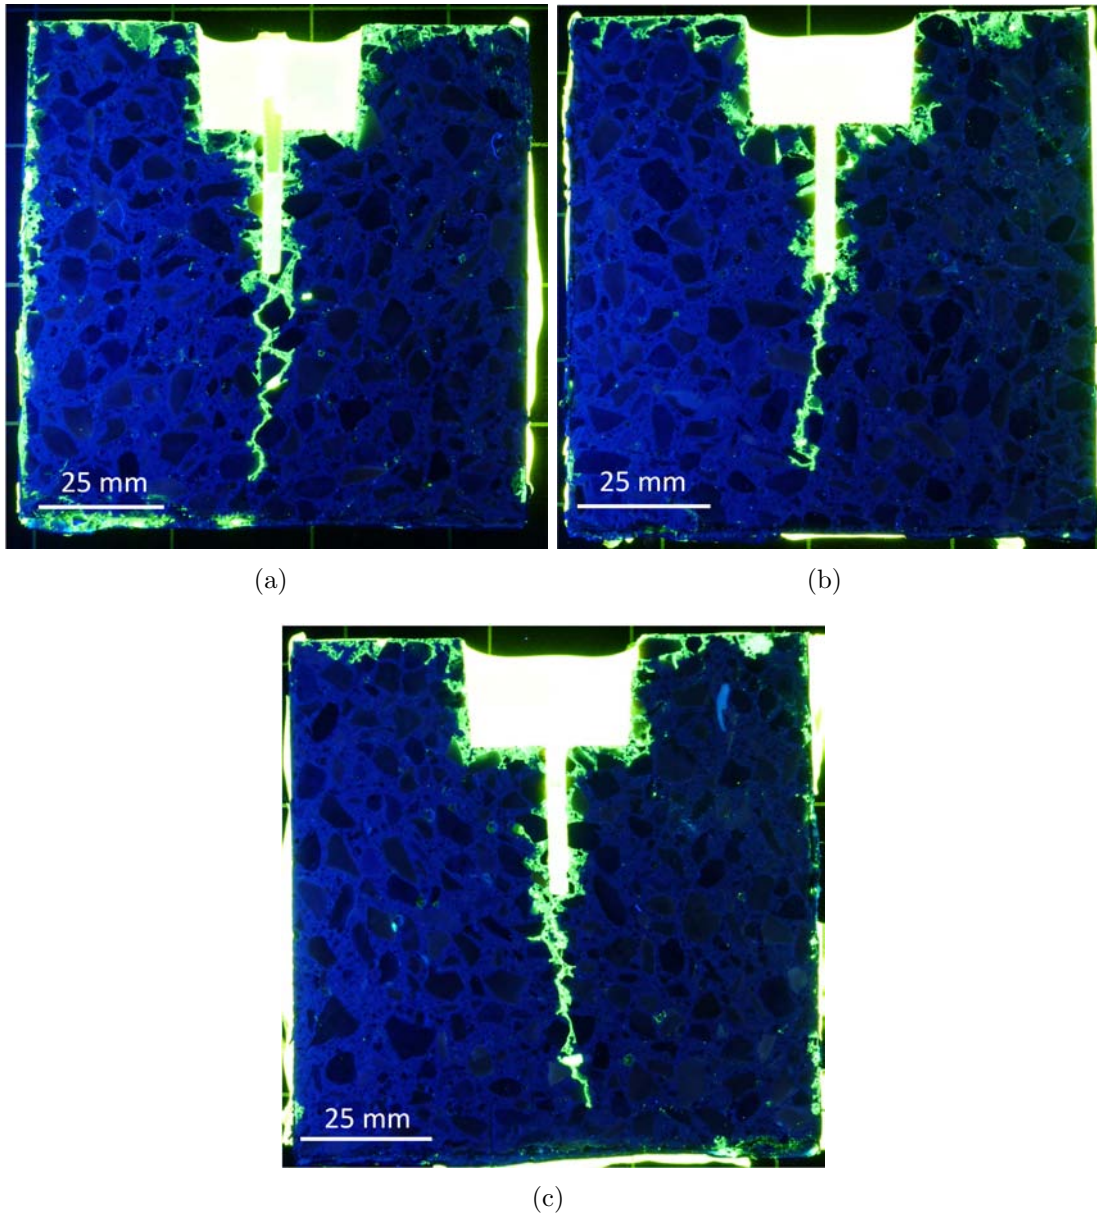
Crack images from Mixture 2, 0.20 mm CMOD specimen after first impregnation. (Author's photos)
